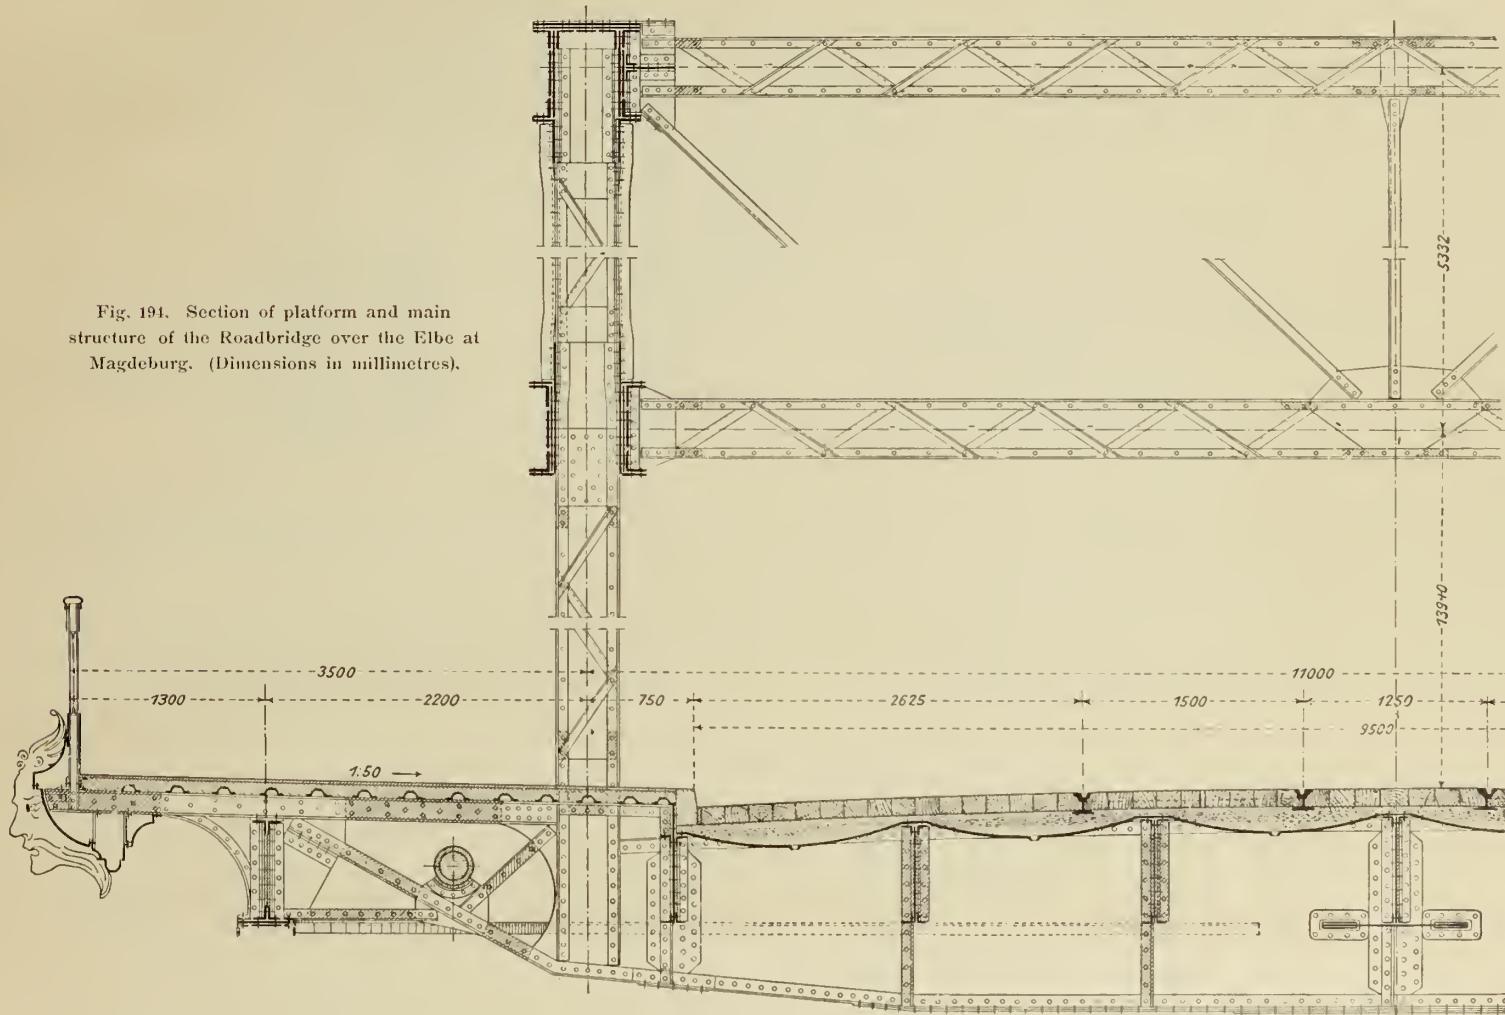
Section of platform and main structure of the Roadbridge over the Elbe at Magdeburg. (Dimensions in millimetres).
